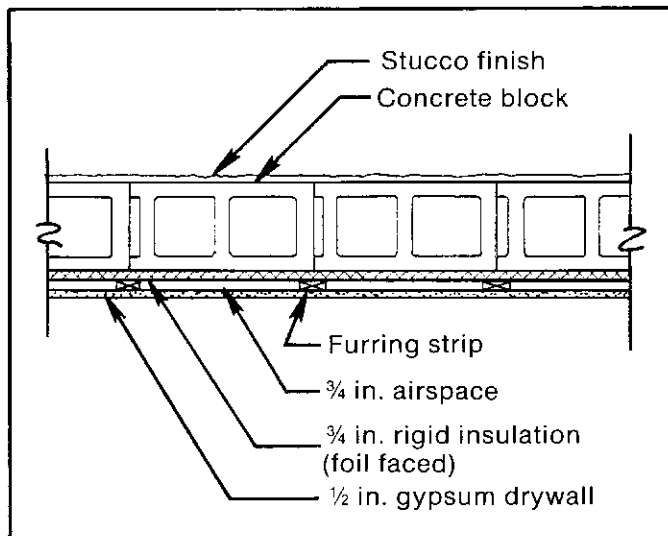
Plan View of Interior Radiant Barrier System as Applied to Concrete-Block Construction
